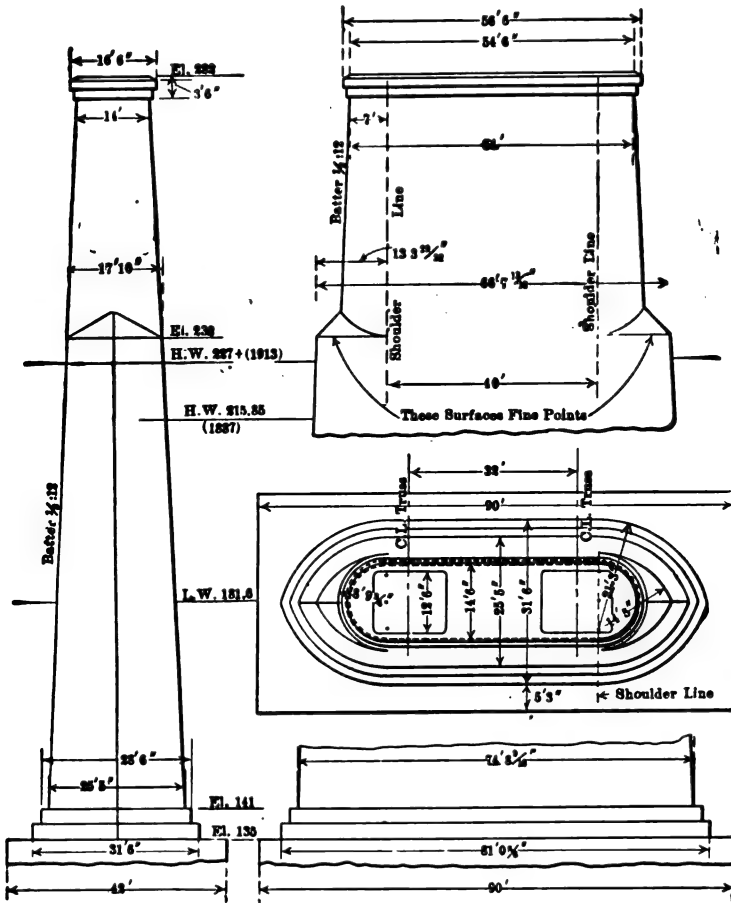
MEMPHIS BRIDGE, MAIN PIERS.
